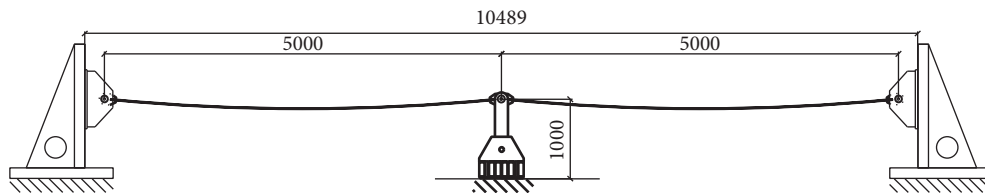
The structural layout of the stress-ribbon bridge model.
